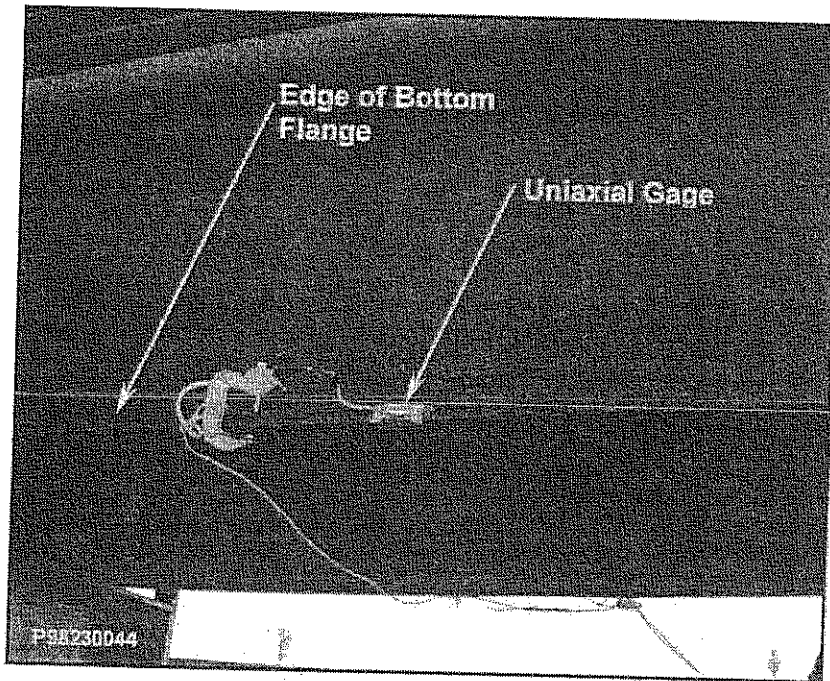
Typical Uniaxial Strain Gage Installed on the Edge of a Flange
